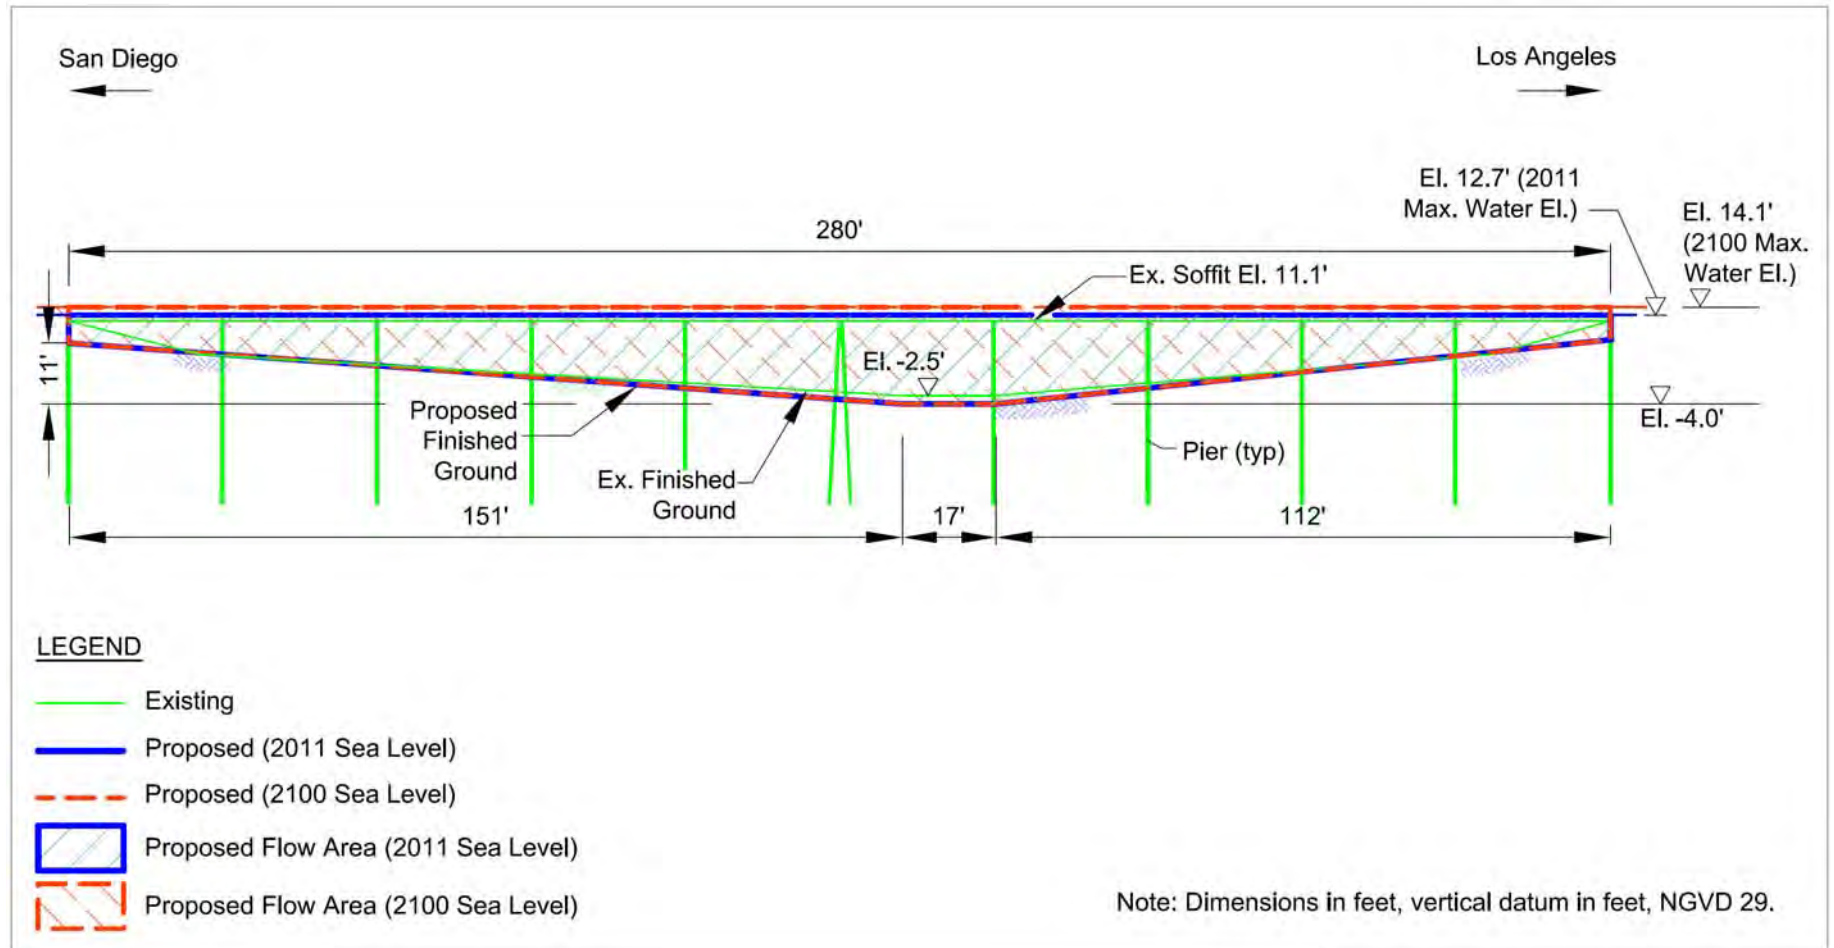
Desired Channel Cross Section of Railroad Bridge at Buena Vista Lagoon
